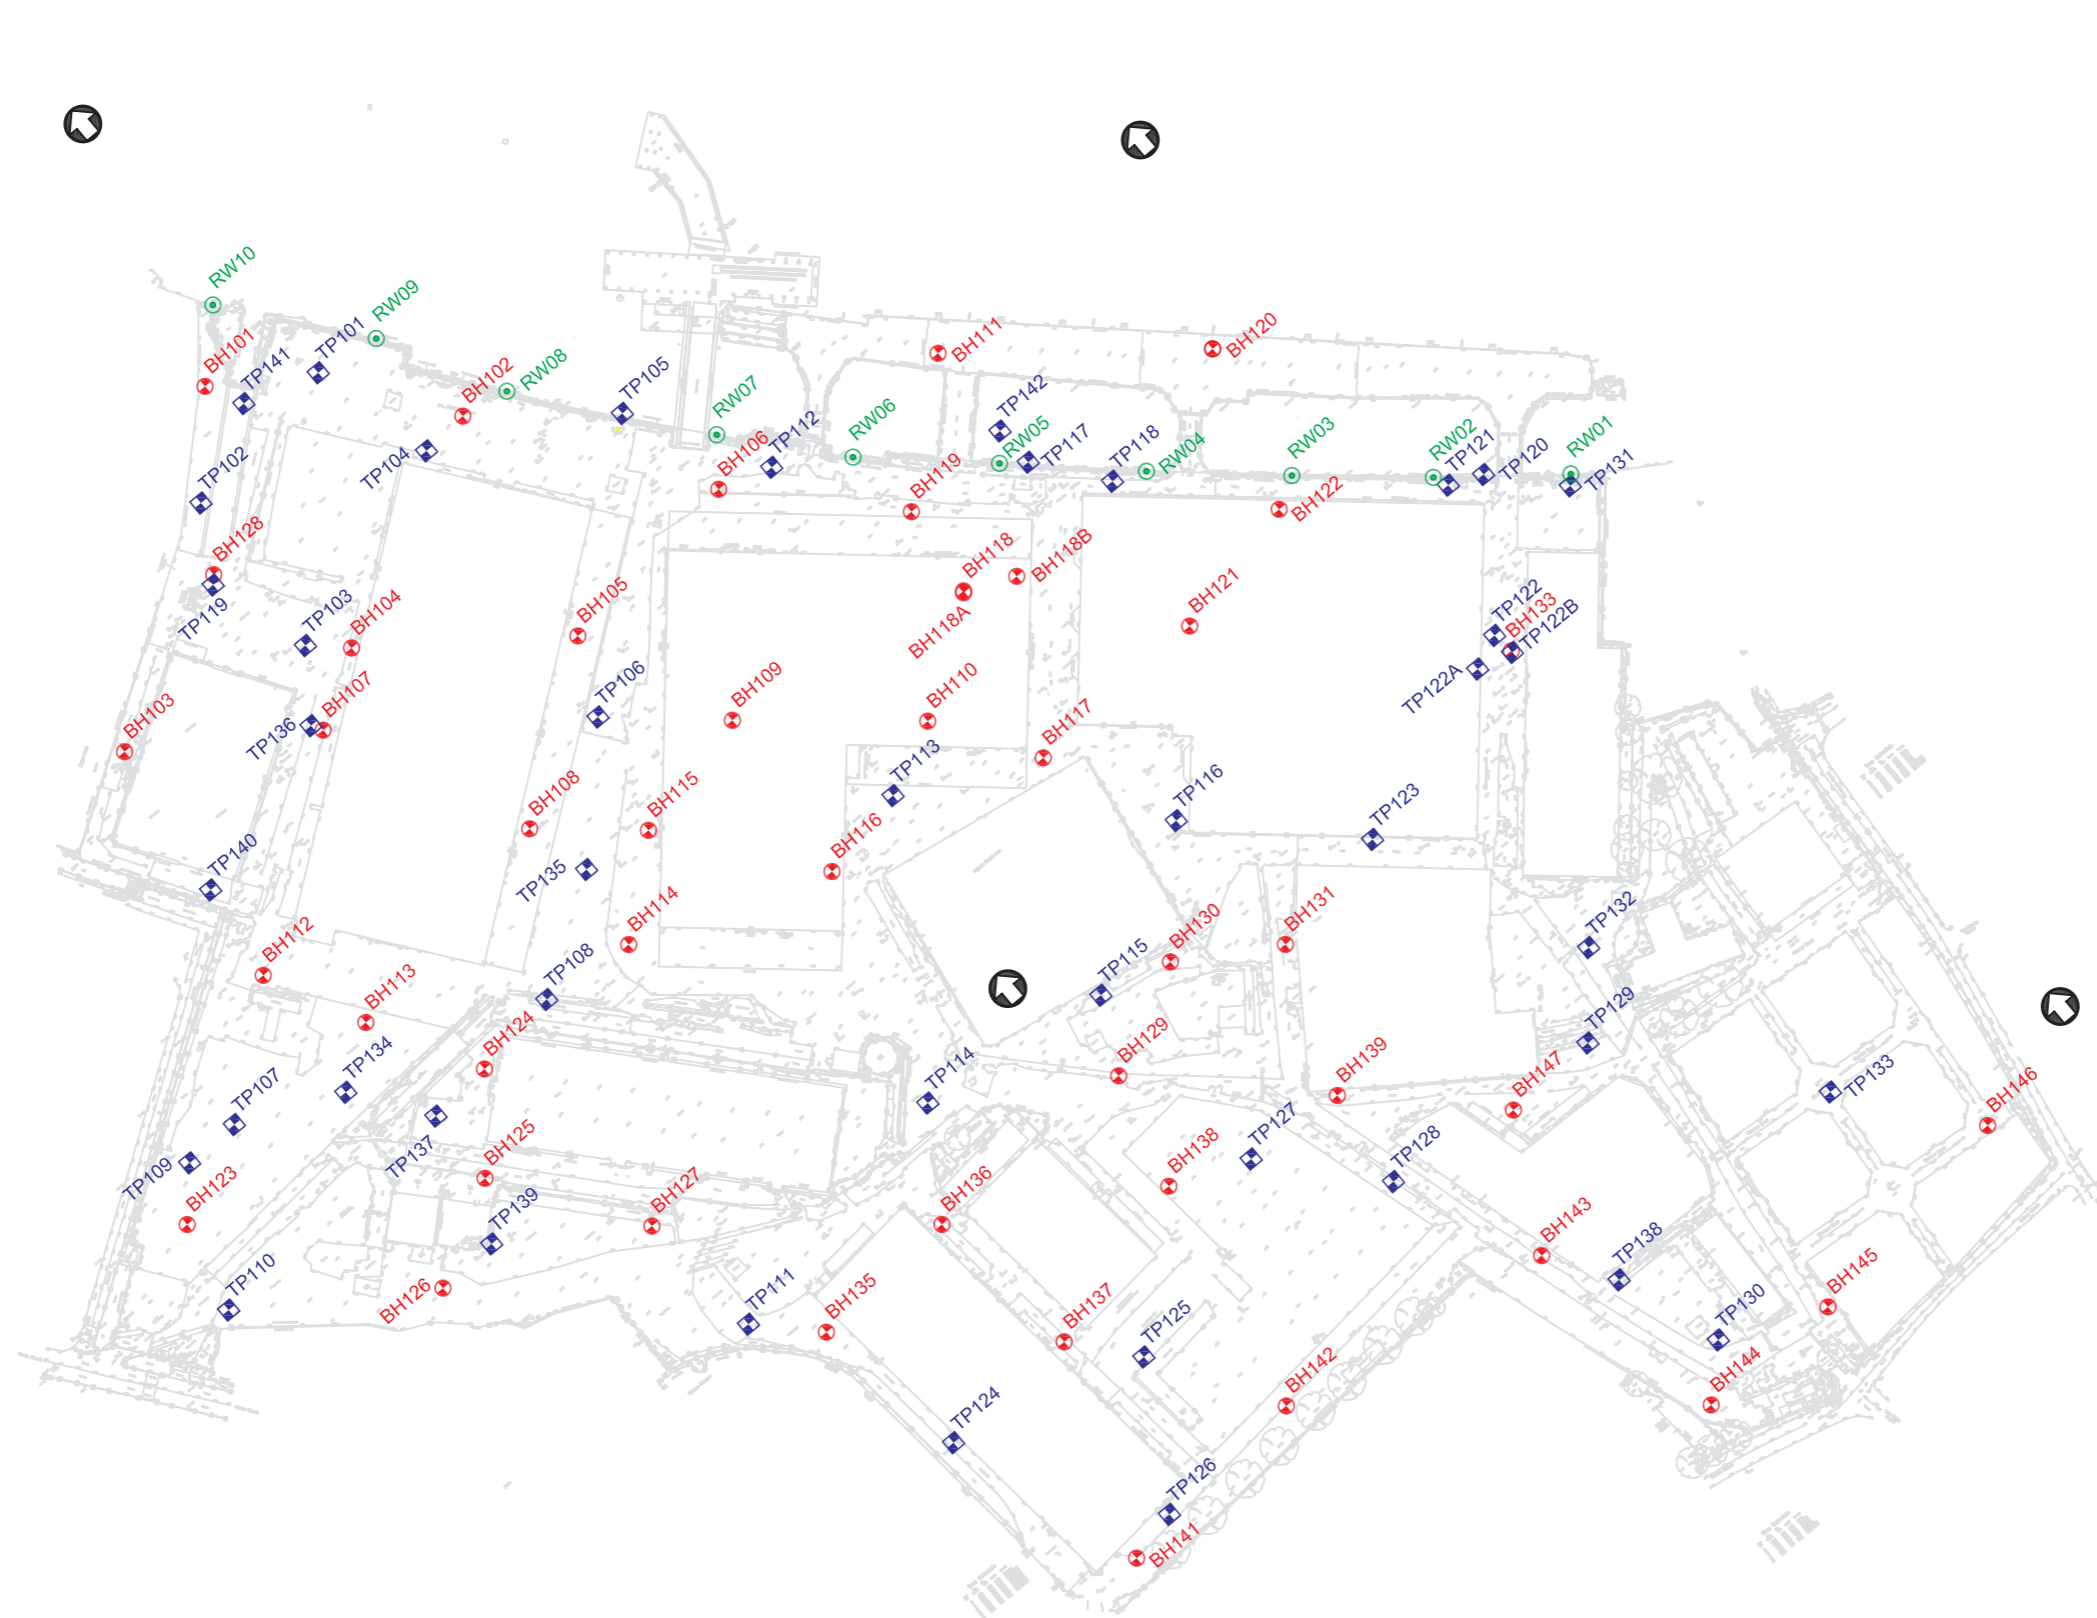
Borehole and trial pit location plan (Mott MacDonald Limited, Exploratory Hole Location Plan, Project No F15742, Drawing No 1)
